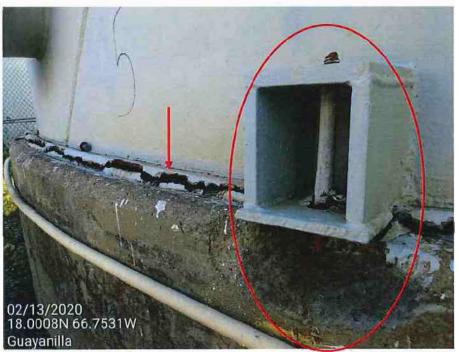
Anchor bolt center is about 3.25" to 3.5" clear cover, from foundation exterior face.
